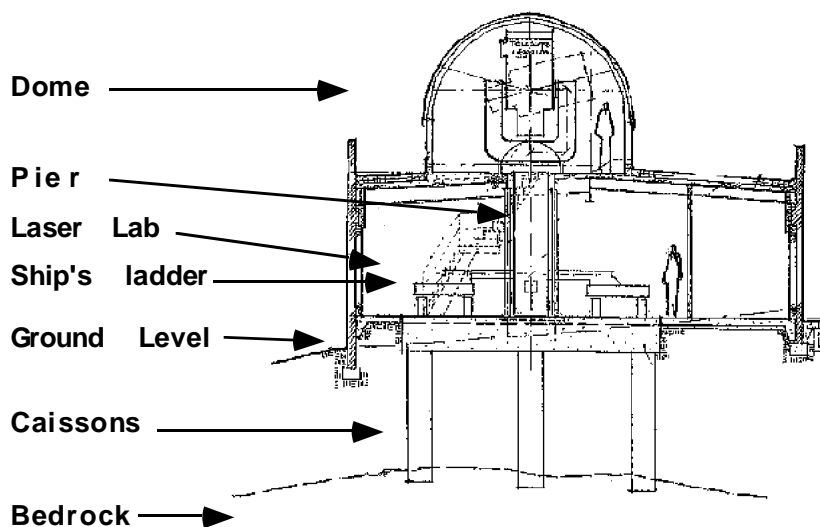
Architect's schematic of OCTL building section showing the caissons that anchor the laser lab 8 meters into the bedrock.
